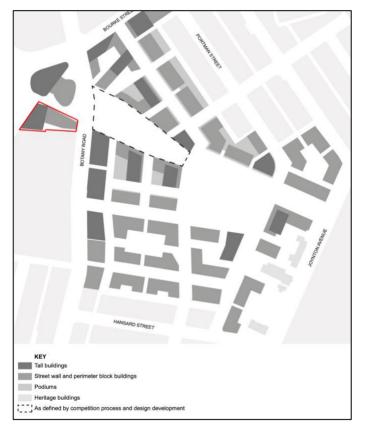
Required Building Envelopes with the Site Outlined in Red Source: GSTC DCP 2013 – Stage 2 (Section 6.3 Building Layout)
